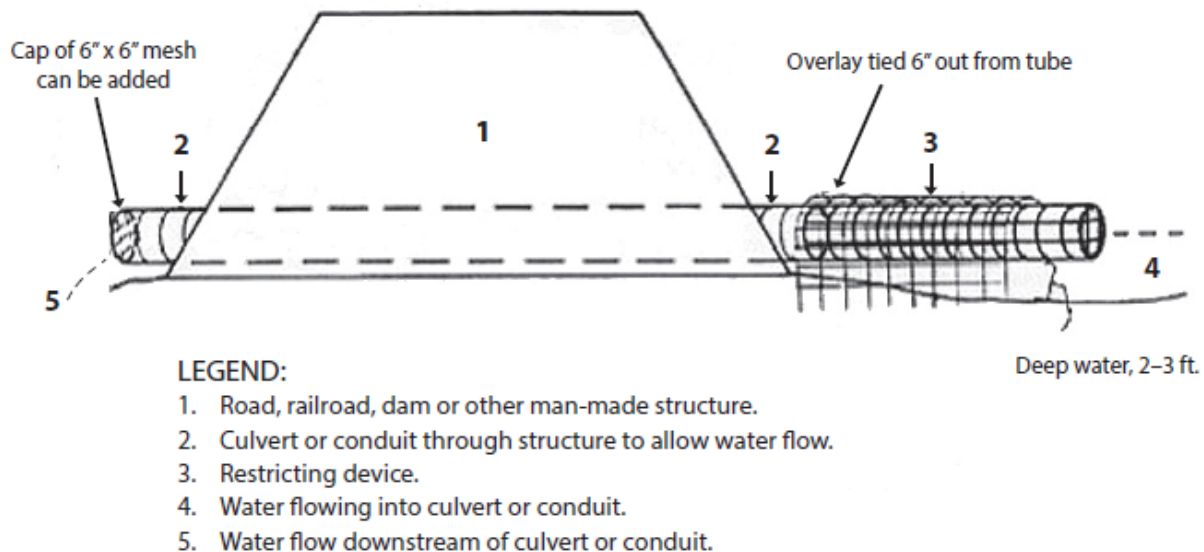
Double-cylindrical-mesh culvert extension installed at upstream (inflow) side of culvert. Note mesh cap on outflow side (Image: Hawley-Yan 2016)
